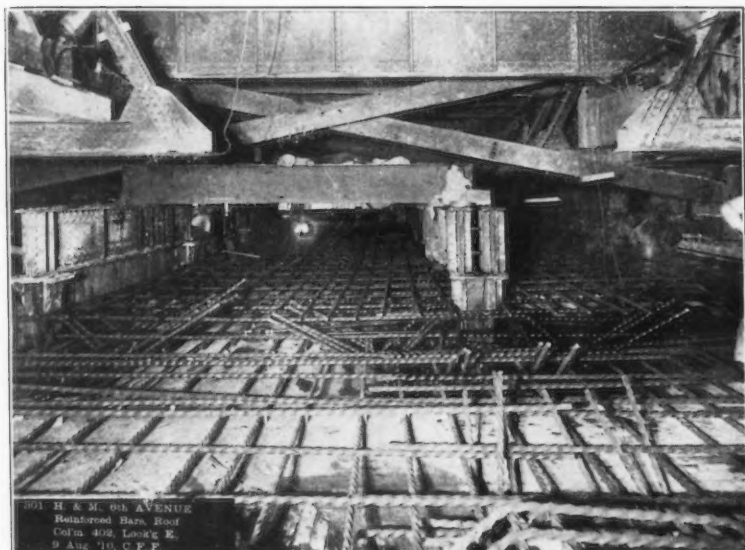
REINFORCING RODS, GROINED ARCH FORMS, AND STEEL GRILLAGES FOR FOUNDATIONS OF ELEVATED RAILROAD COLUMNS.
